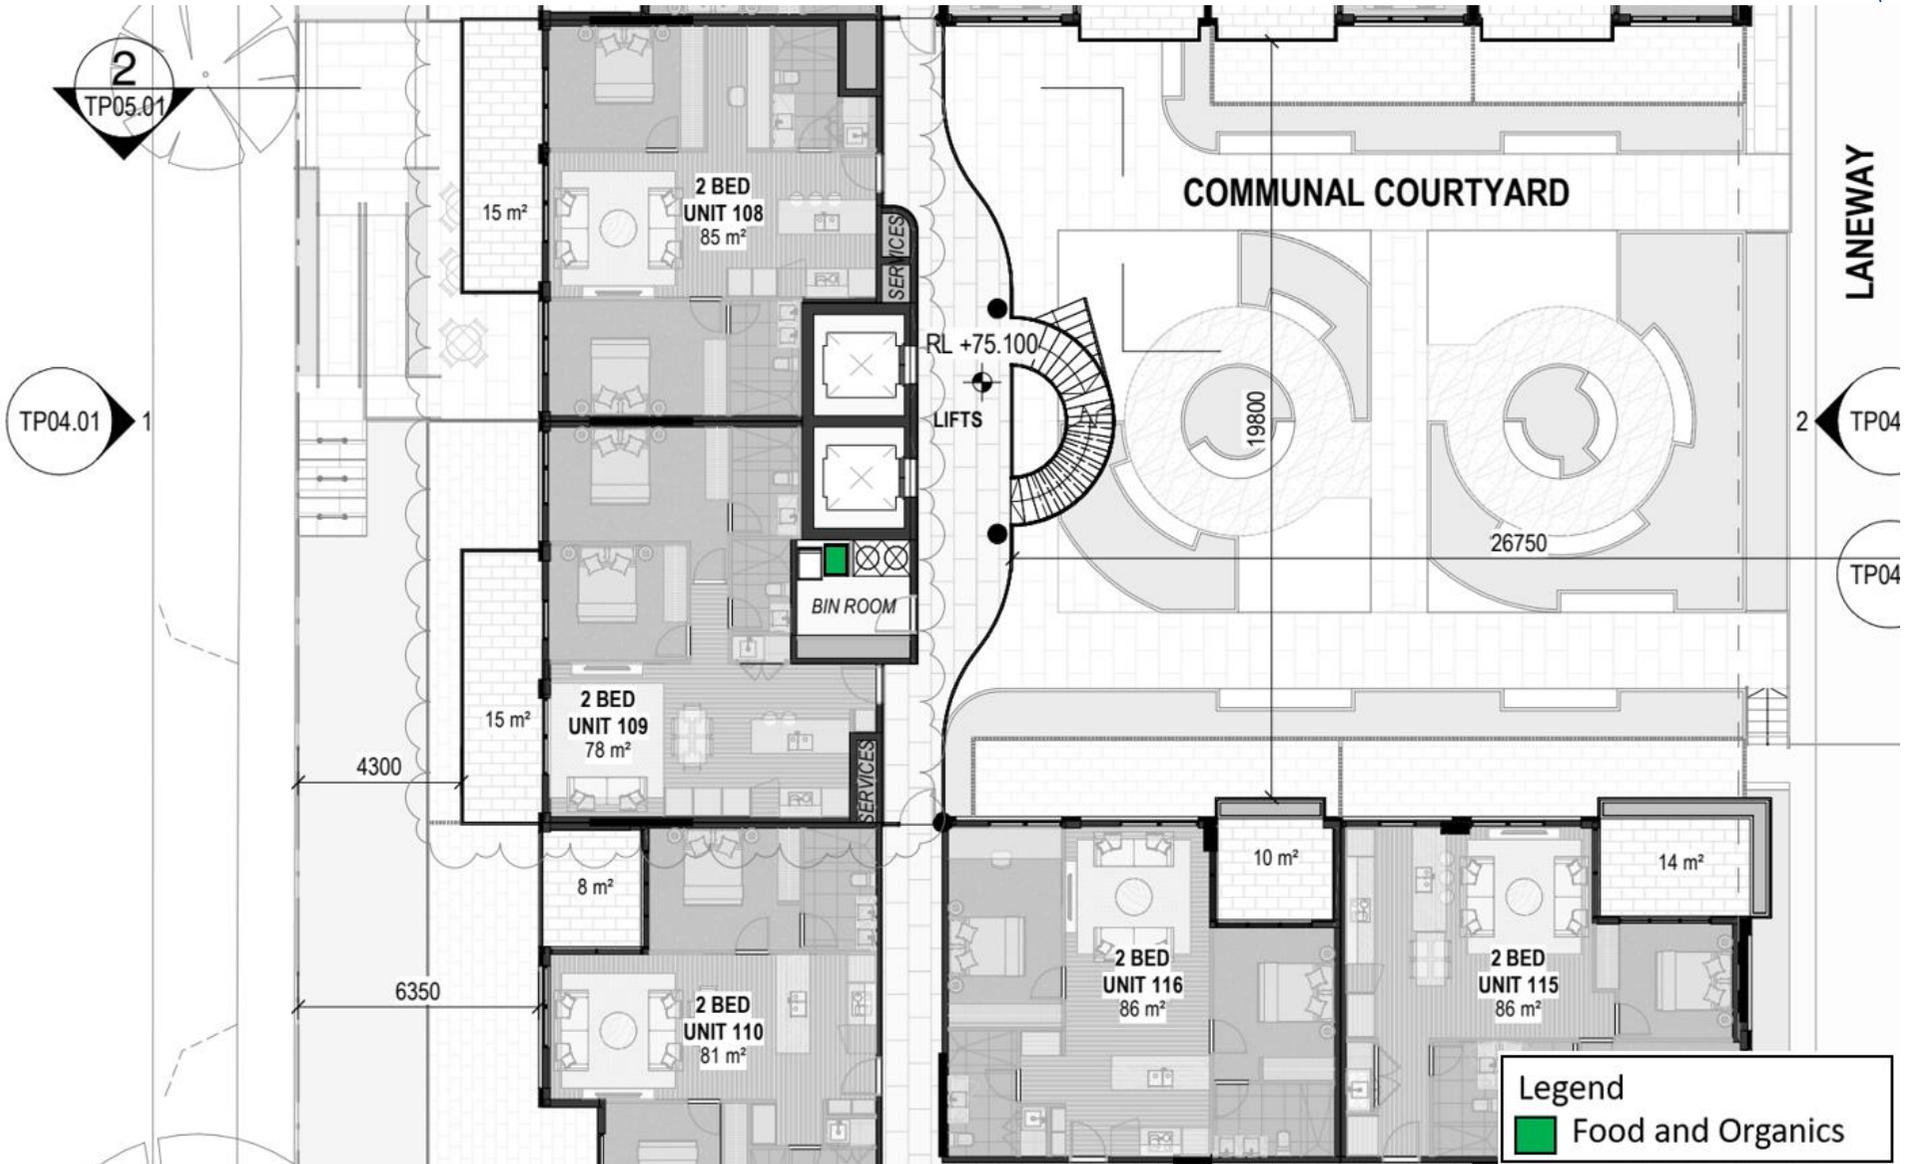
DEVELOPMENT PLAN – FIRST FLOOR BIN STORAGE AREA – CURRENT
